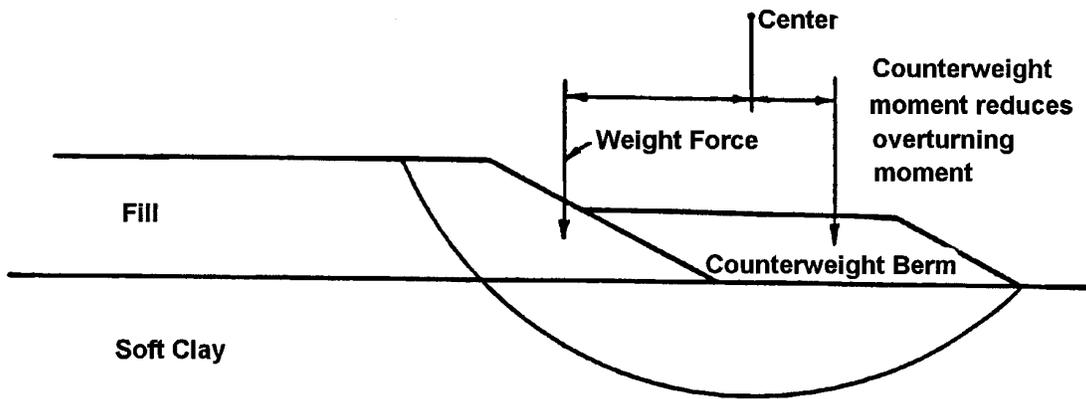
Use of Counterweight Berm to Improve Slope Stability
